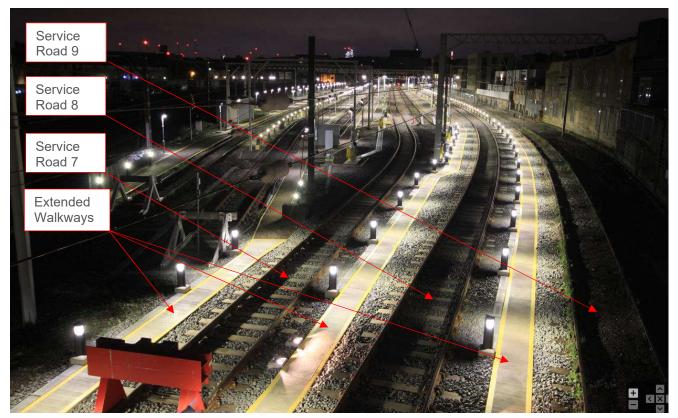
Camden Carriage Sidings walkway extension lighting installation
